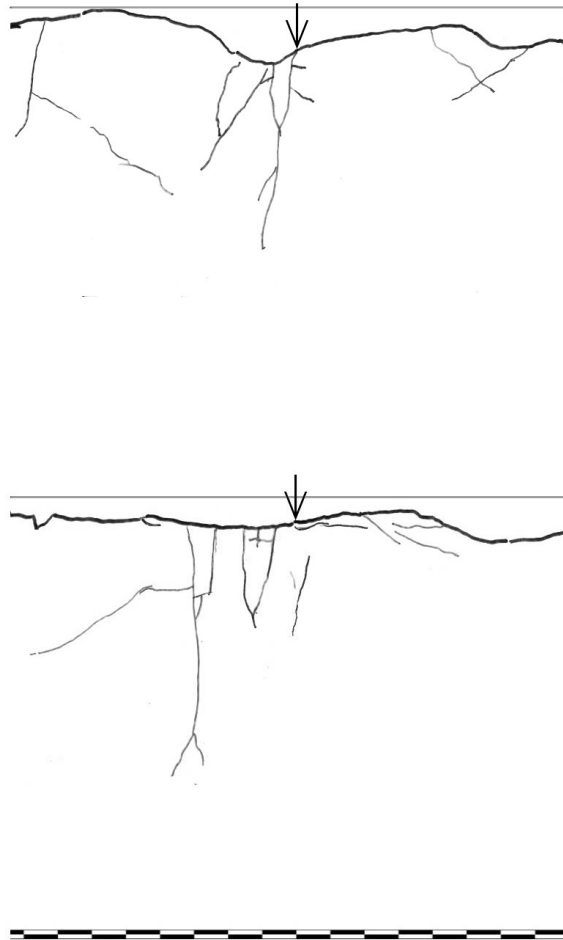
Surface and crack pattern under the cutter groove in core sample R_5437_1-4_25.
